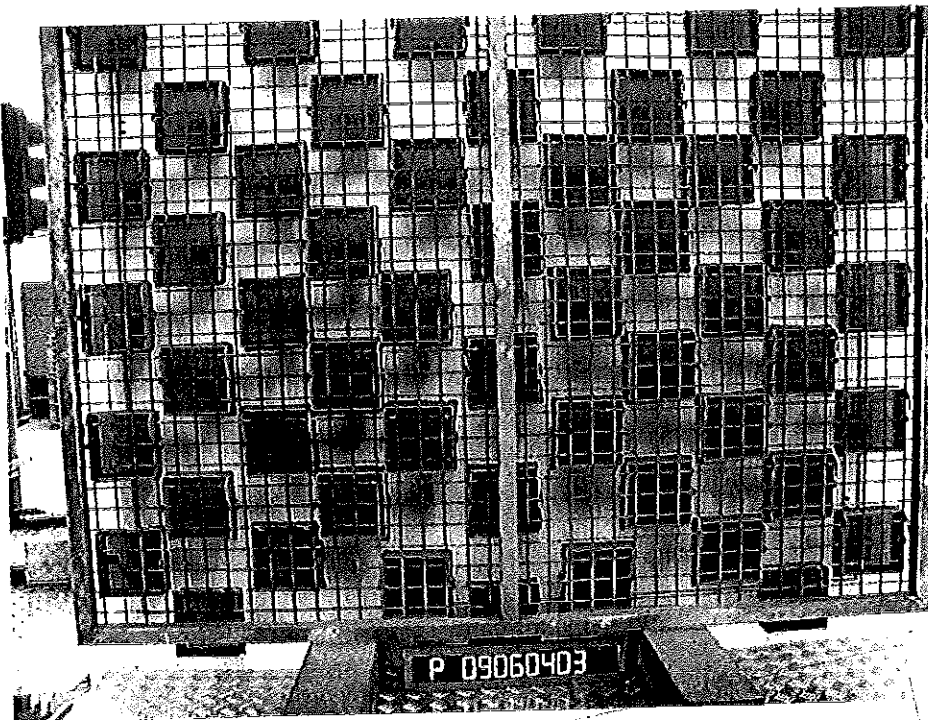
Rear view of the test object with indicators after test no. 090604-03
